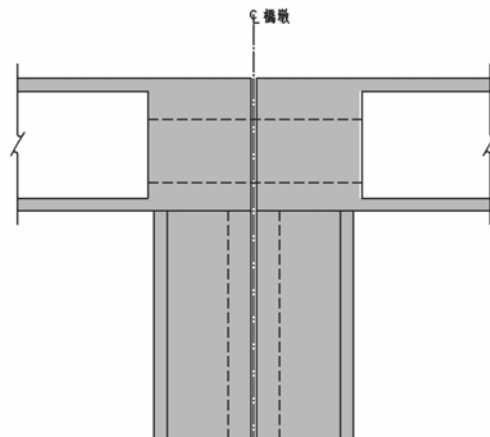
Longitudinal section of full-rigid-frame type viaduct (1/2)
